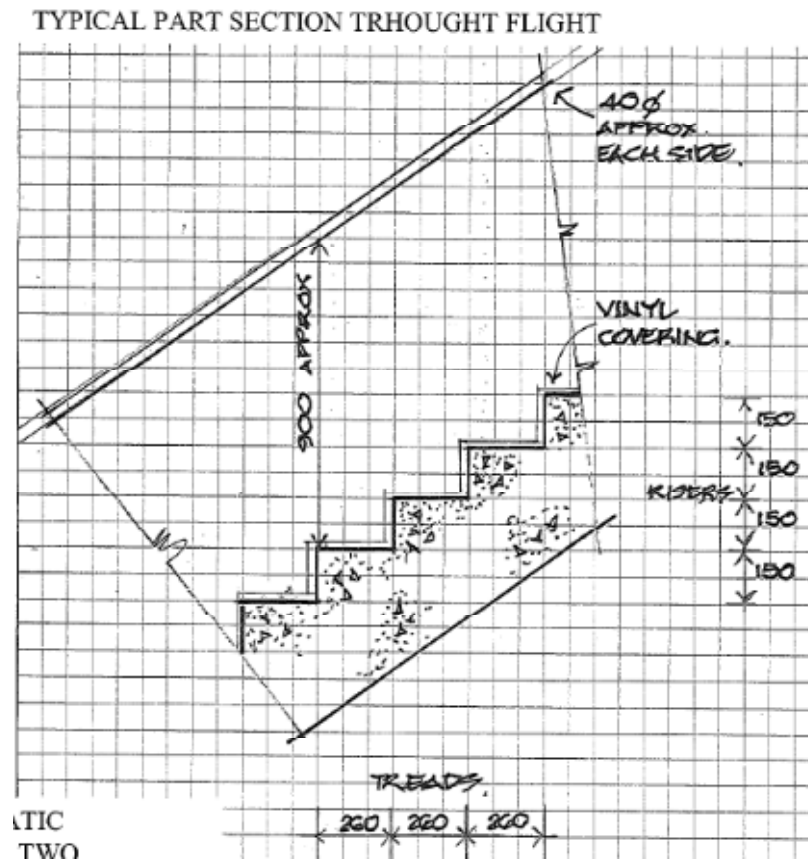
Majestic Stair Cross Section (MacLennan, 2011)
